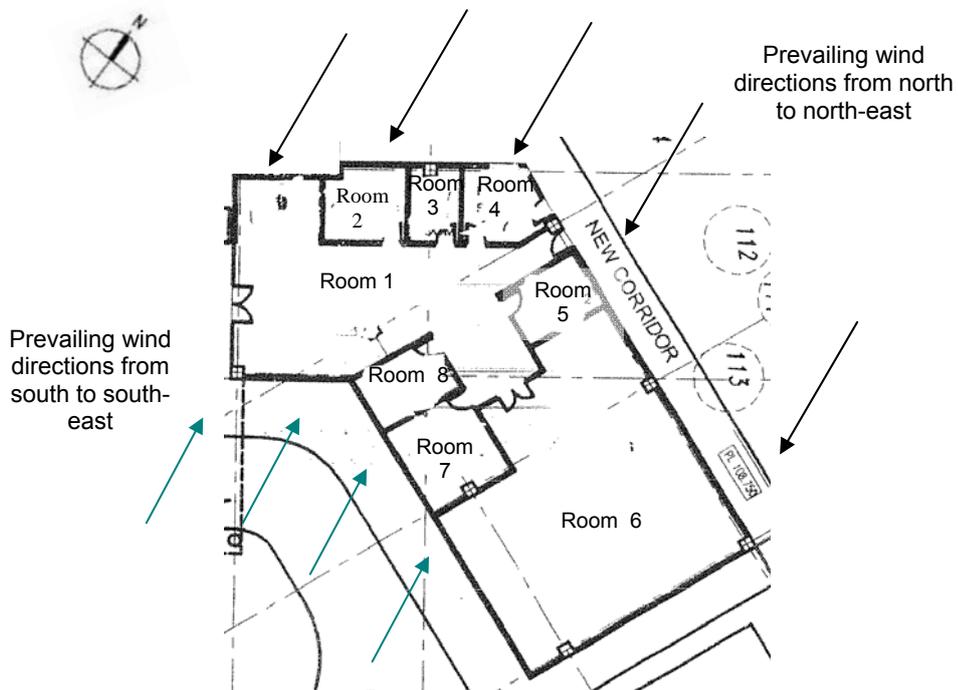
Building layout shows not all rooms with window openings facing the north and south directions. Room 2 to Room 5 would only have prevailing wind in one direction. Only Room 1 and 6 can be considered meeting the requirement 1-4(a).
